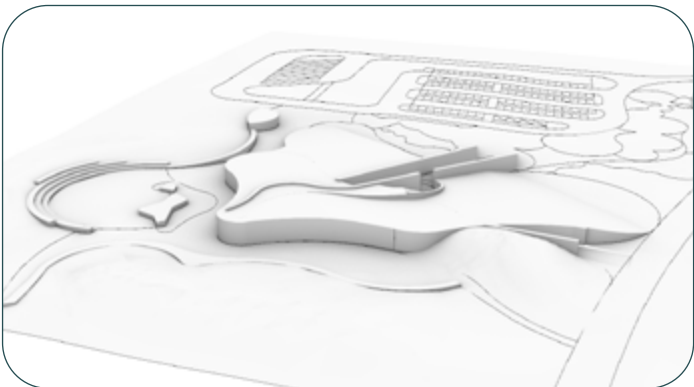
View 4 - Elevated view looking at the north western elevation and entry road
